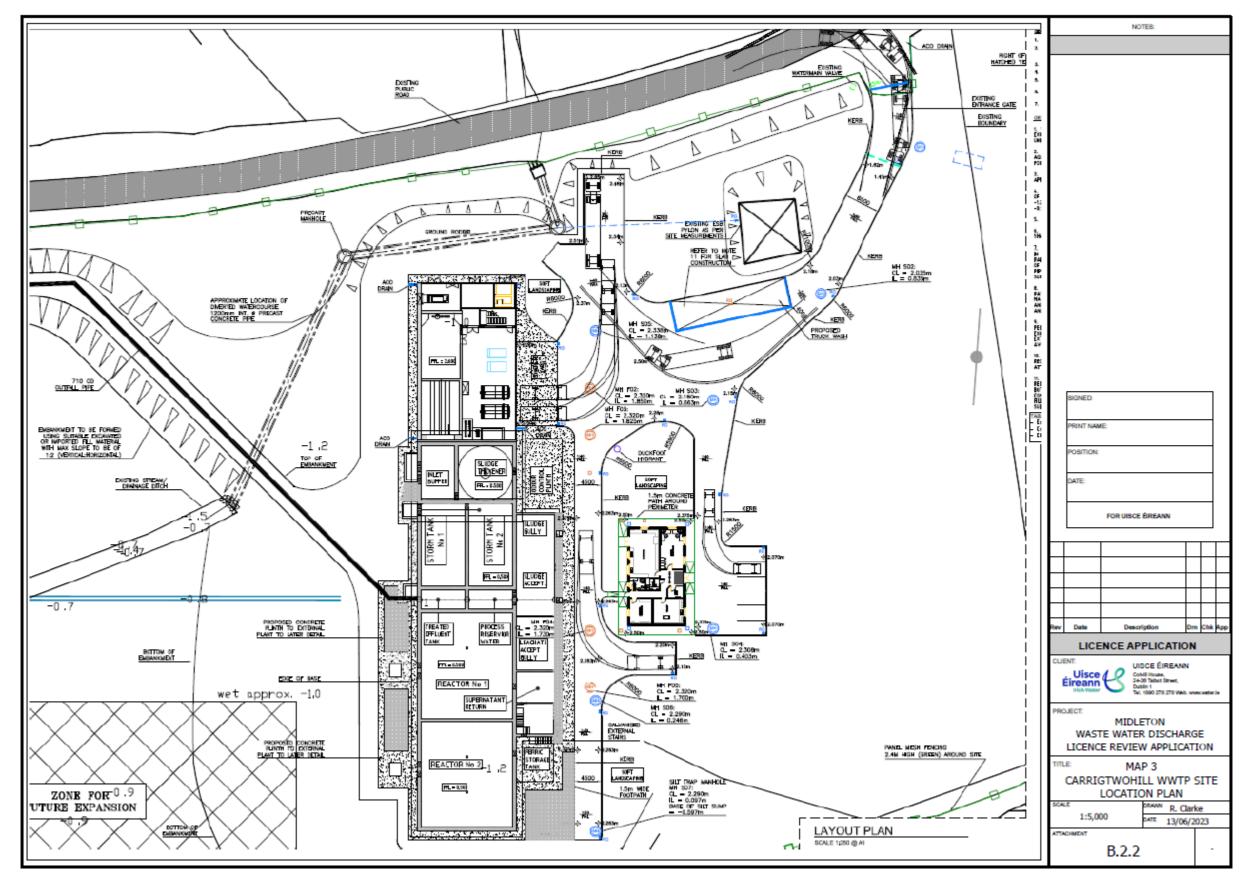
Carrigtwohill Wastewater Treatment Plant Layout
